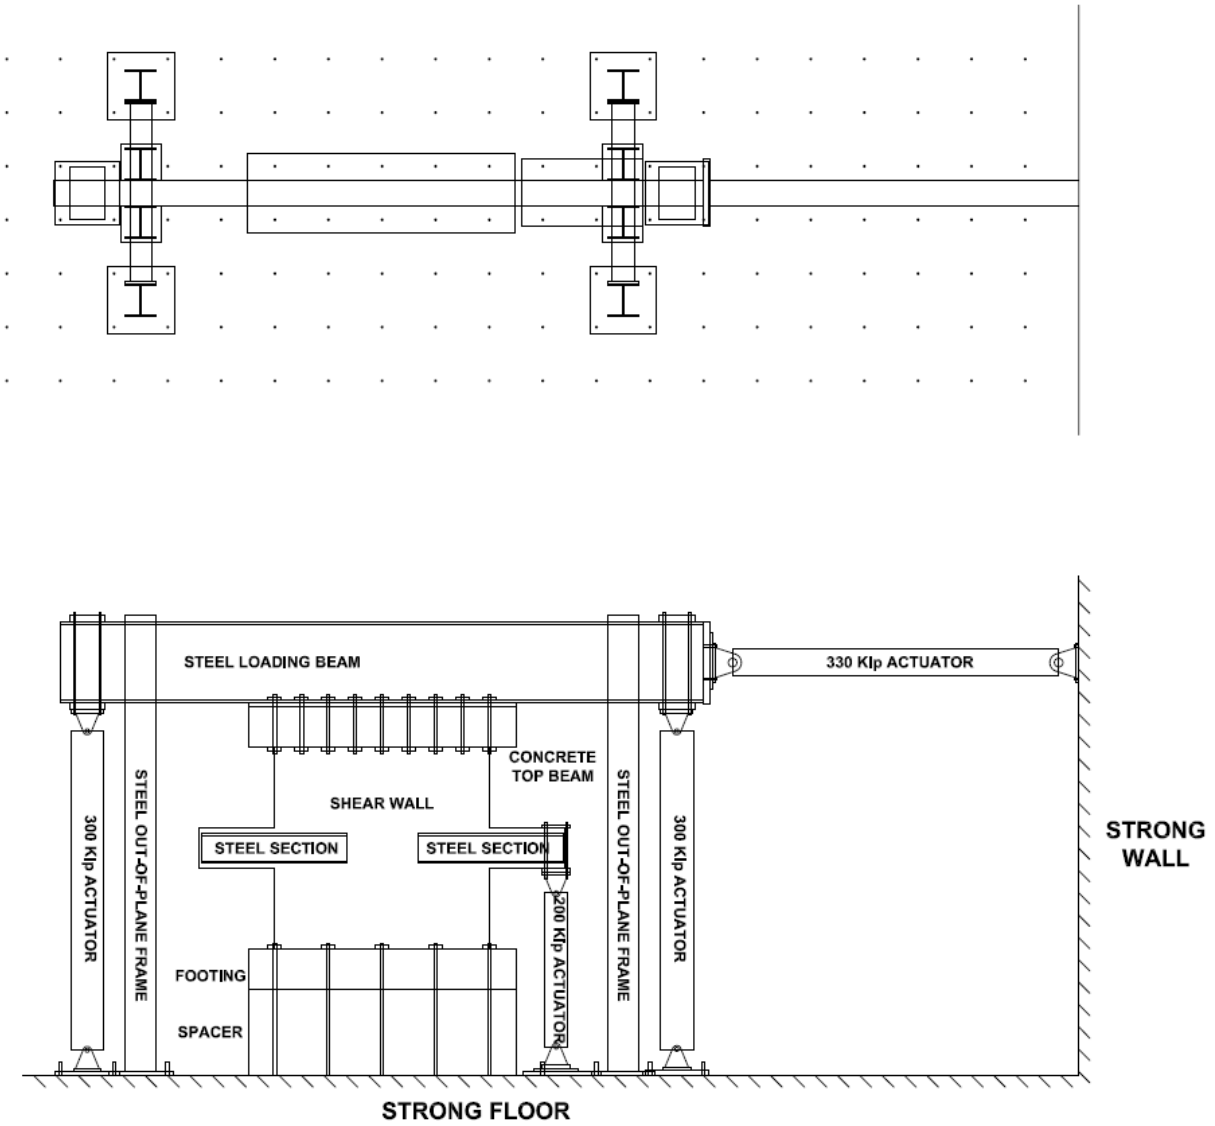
Test Set-Up a) Plan View and b) Elevation View
